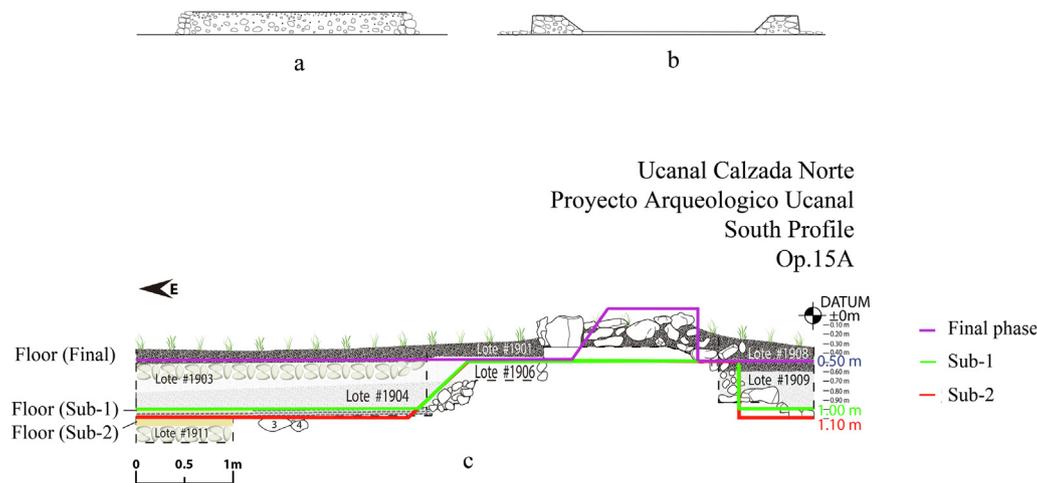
Causeways in the Maya area: (a) schematic of typical raised causeway in the Maya area; (b) schematic of inverted causeway found at Ucanal (digitization by C. Halperin); (c) south profile of Calzada Norte's western wall (digitization by E. Perez Zambrano).
